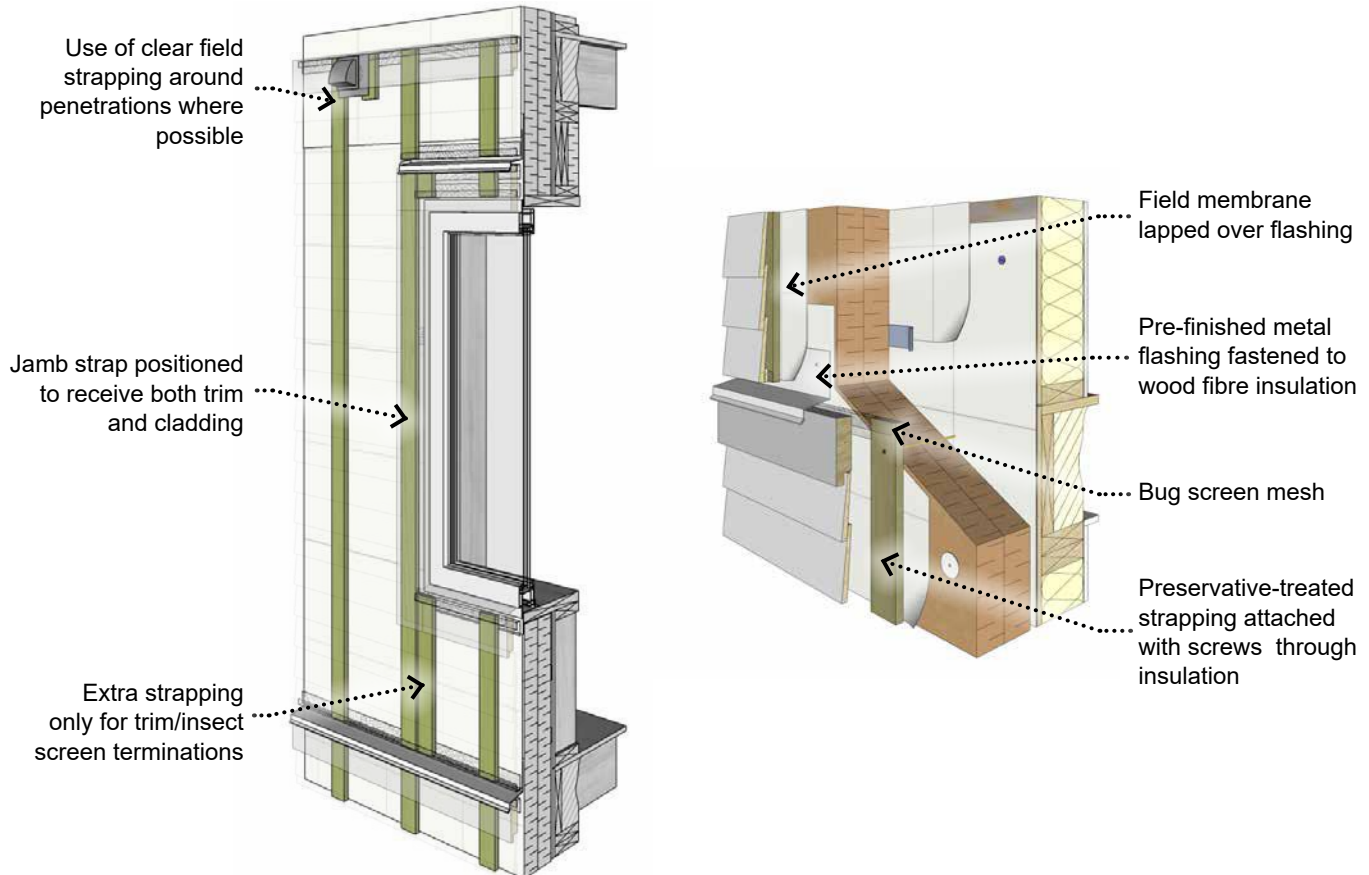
Examples of optimized strapping layout (left) and typical rainscreen detailing at the floor line flashing (right)
